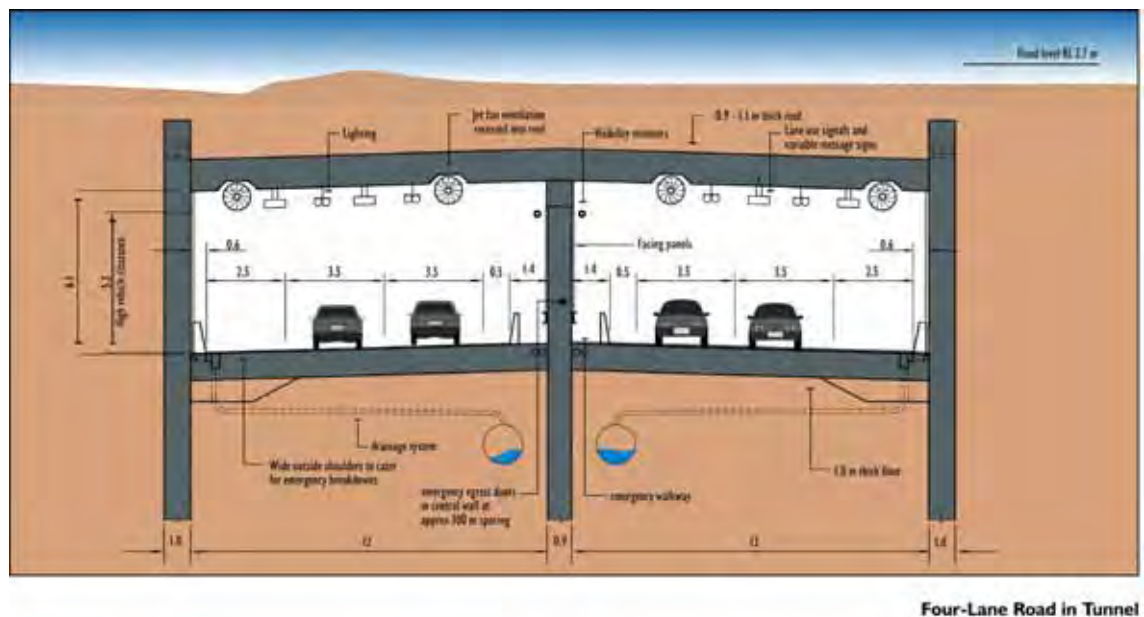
Typical cross-section of the Tugun Bypass road tunnel
